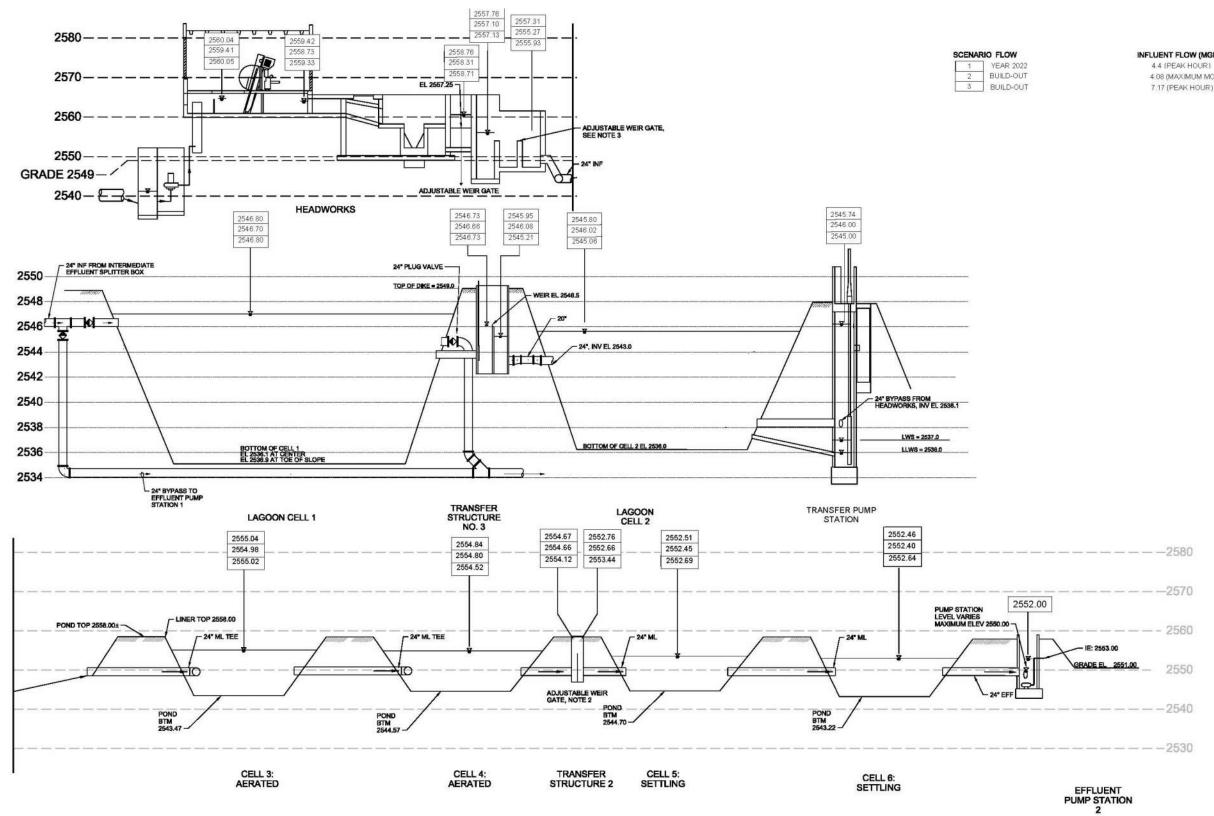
Eagle Sewer District Wastewater Lagoon Treatment Facility Hydraulic Profile Diagram
